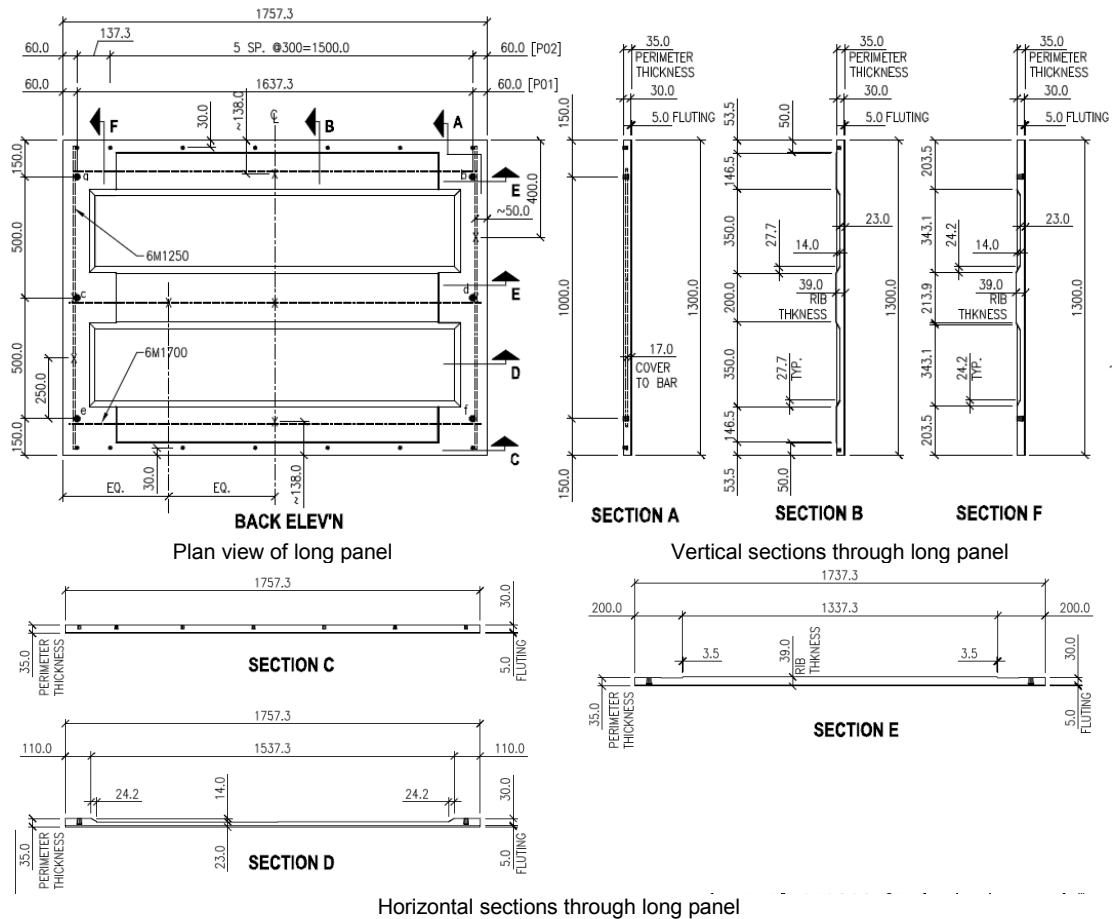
Construction details of prototype long cladding panel #1 (Lafarge Precast).
